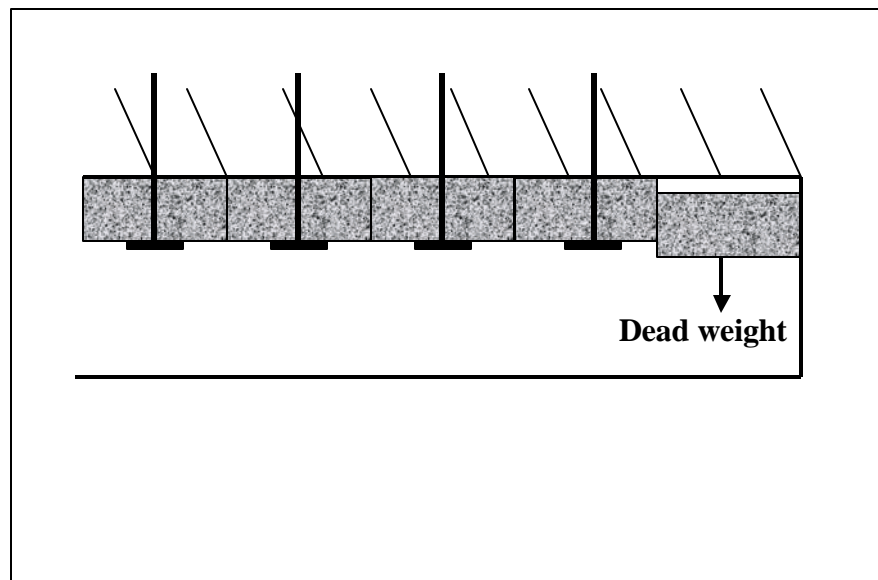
Gravity induced failure of block in hangingwall.
